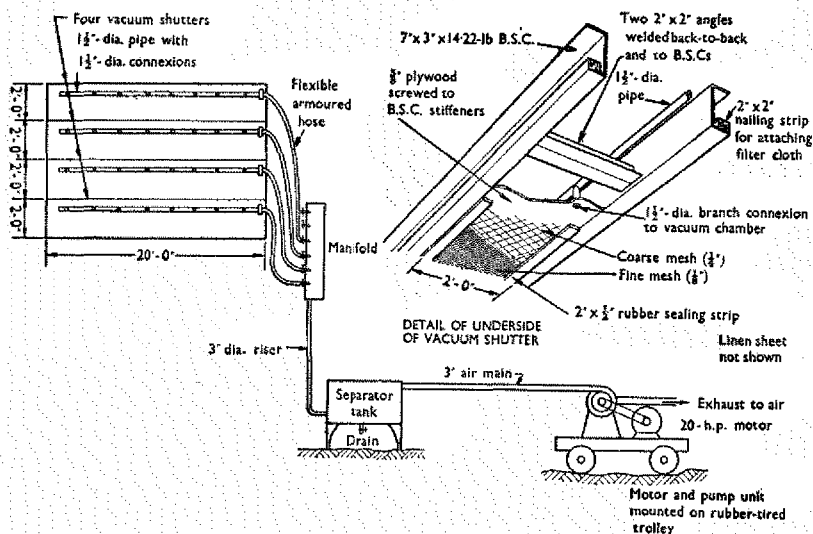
QUOICH DAM. ARRANGEMENT OF VACUUM EQUIPMENT
